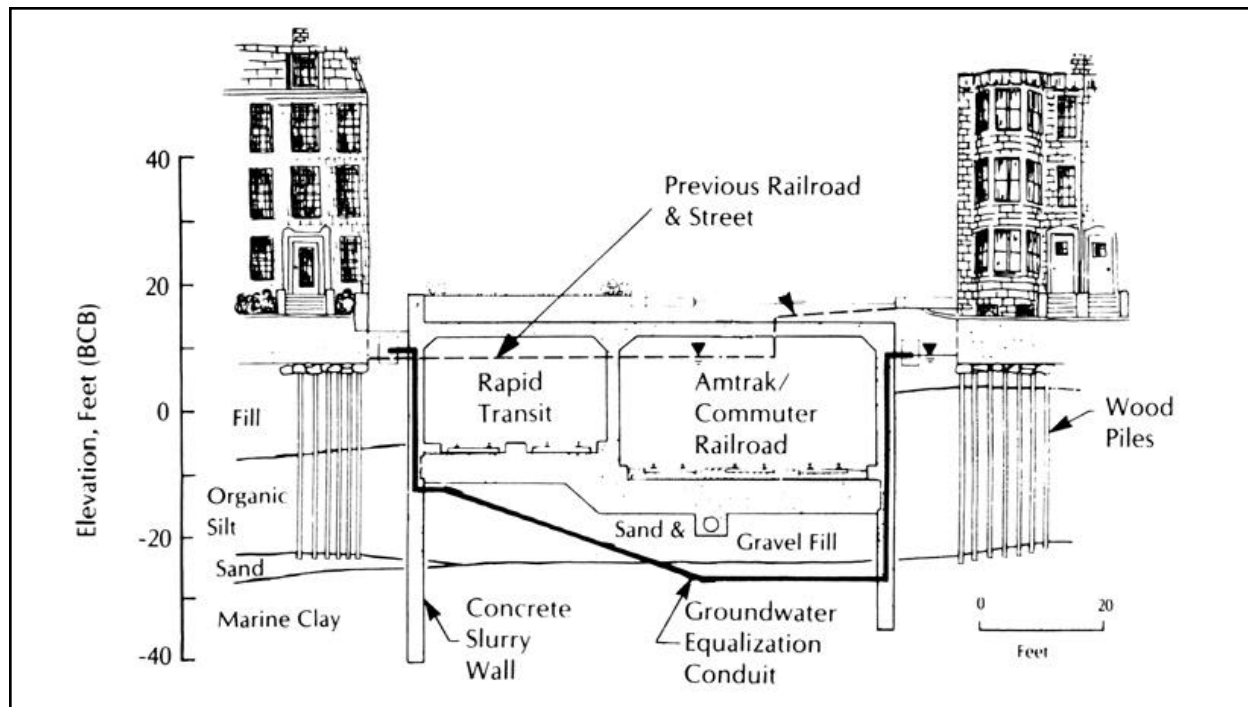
A cross section of the Southwest Corridor Project tunnel, taken at Follen Street.
